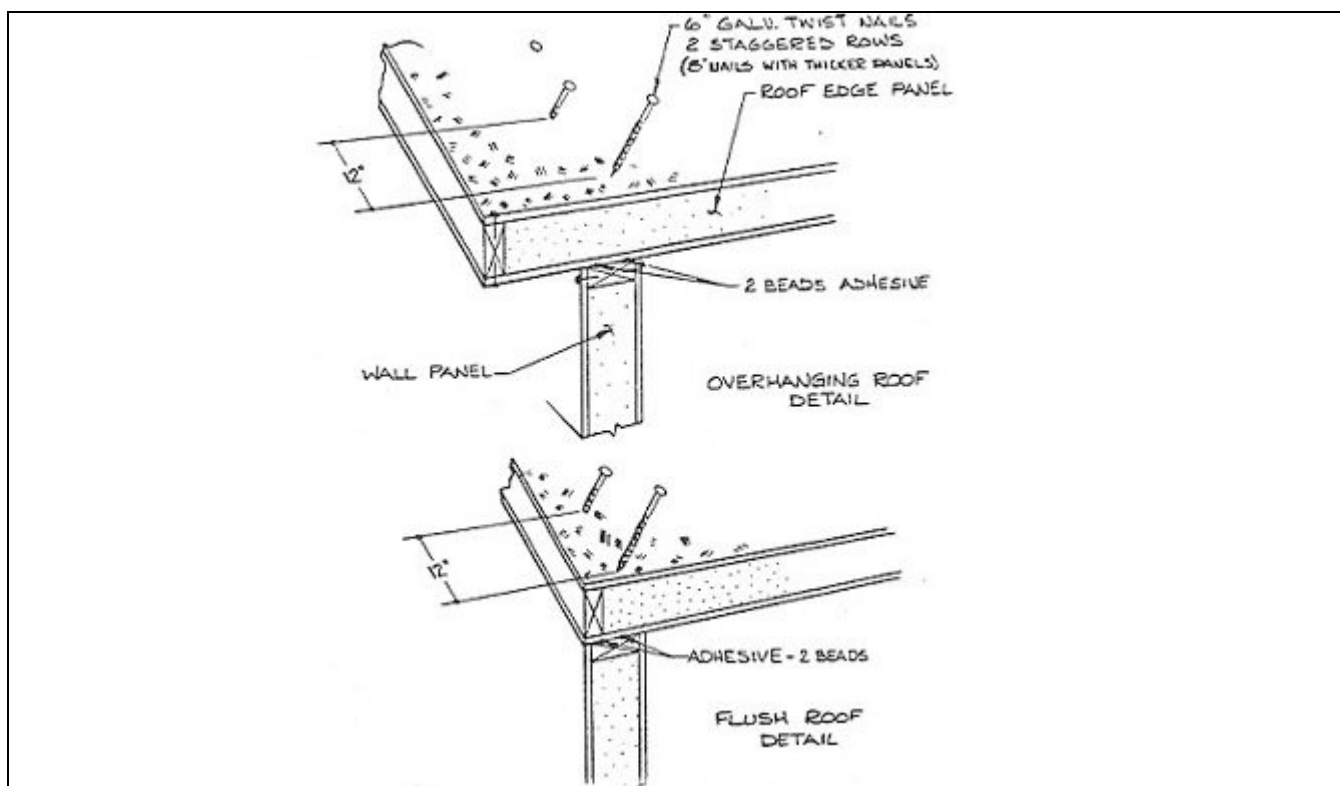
Installing Edge Roof Panel: Follow the plans carefully to determine the proper amount of overhang, if any. Apply two beads of adhesive and nail roof panel to the wall panel as shown.
